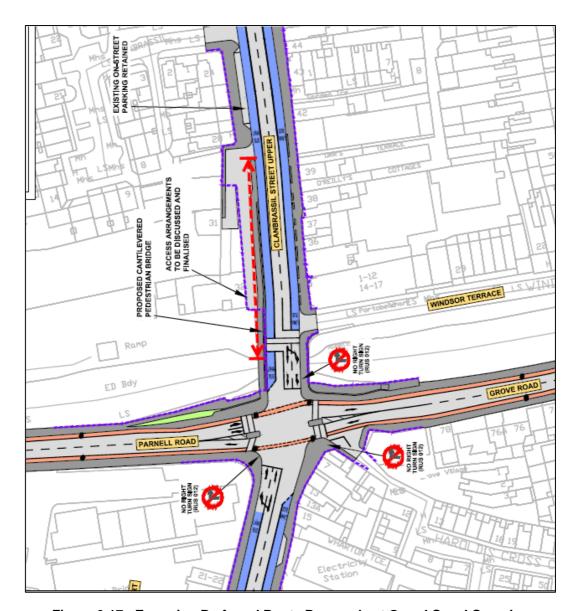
Emerging Preferred Route Proposals at Grand Canal Crossing
